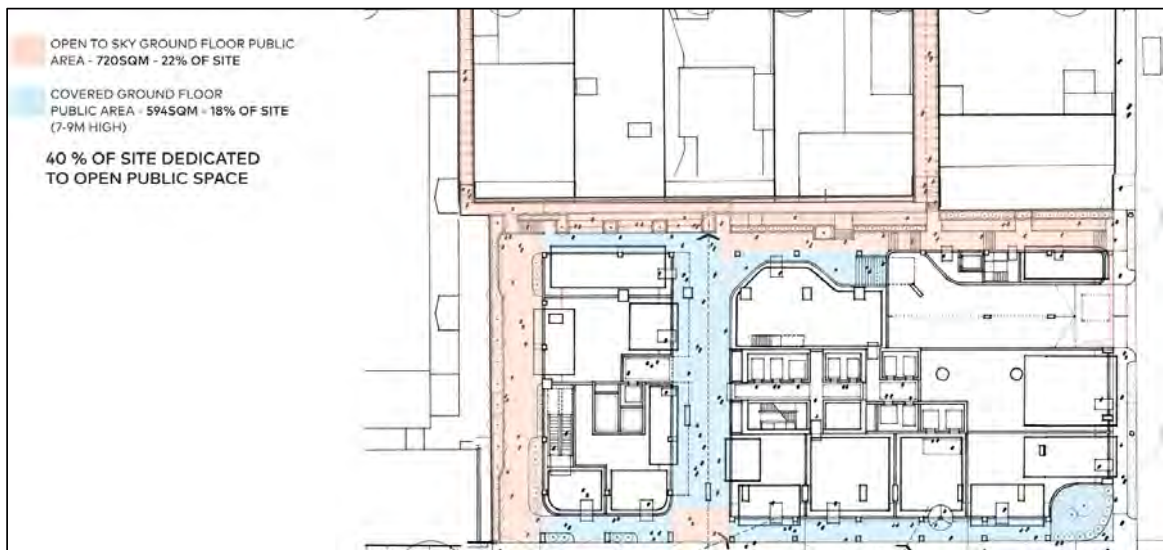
Layout of publicly accessible spaces and connections (Source: Applicant dated June 2025)
